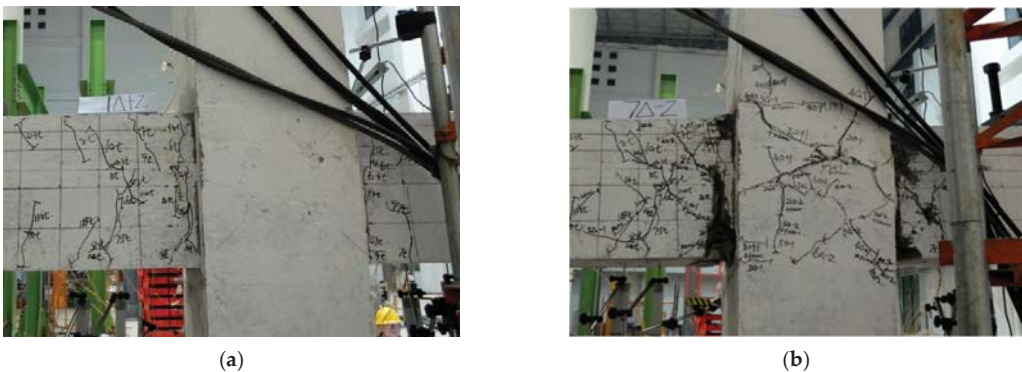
Crack pattern and failure mode of the PC connection: (a) crack at the beam end; (b) failure mode of the PC connection.
